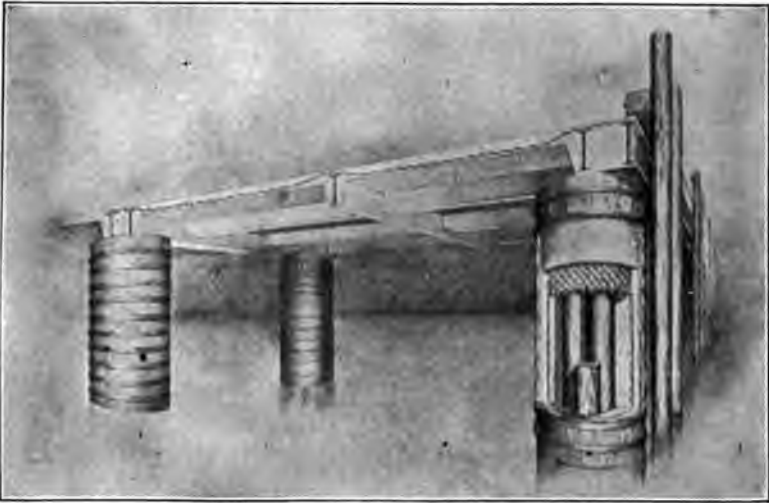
Armoring for Timber Piles, Union St. Wharf, San Francisco, Cal. State Harbor Commission, San Francisco, Cal., for pier construction in toredo infested waters, and used in the construction of the Union Street Wharf, San Francisco. Figure 270 shows the details of the caissons and the wharf floor supported by them. Three carrying piles were used. These were cut off, one 2 ft., one 6 ft., and one 8 ft. below the wharf level. Wooden stave cylinders of 3-in. plank were placed about the piles and driven firmly into the mud and sealed at the bottom. They were then pumped out; a cylinder of No. 16 gauge expanded metal having a diameter 6 ins. less than the surrounding cylinder was then put in place and the tube filled with concrete.
